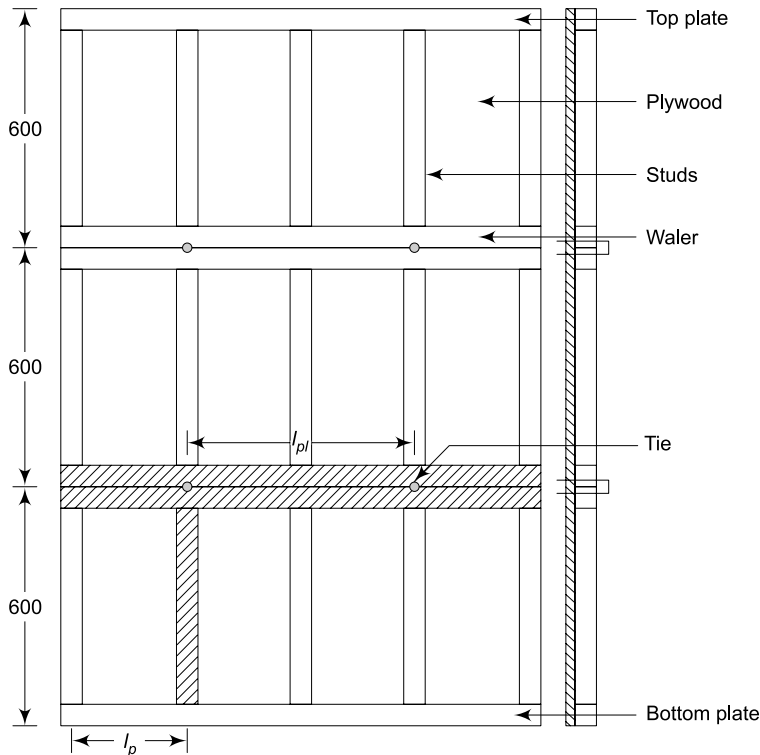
The Arrangement of Different Form Panels and Tie Rods in Elevation and Sectional View.
